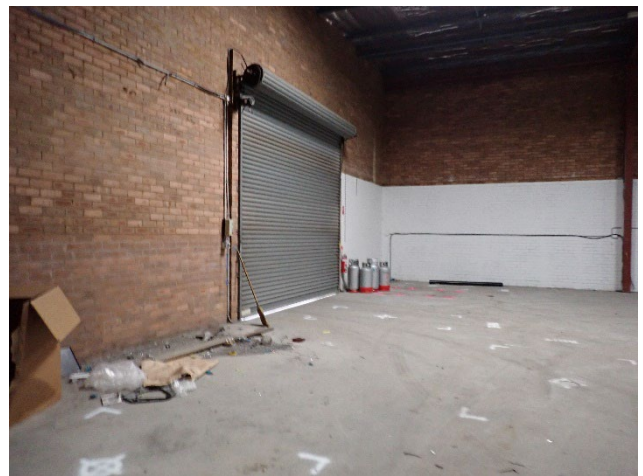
Interior view of the subject site showing concrete floor and brick walls.
